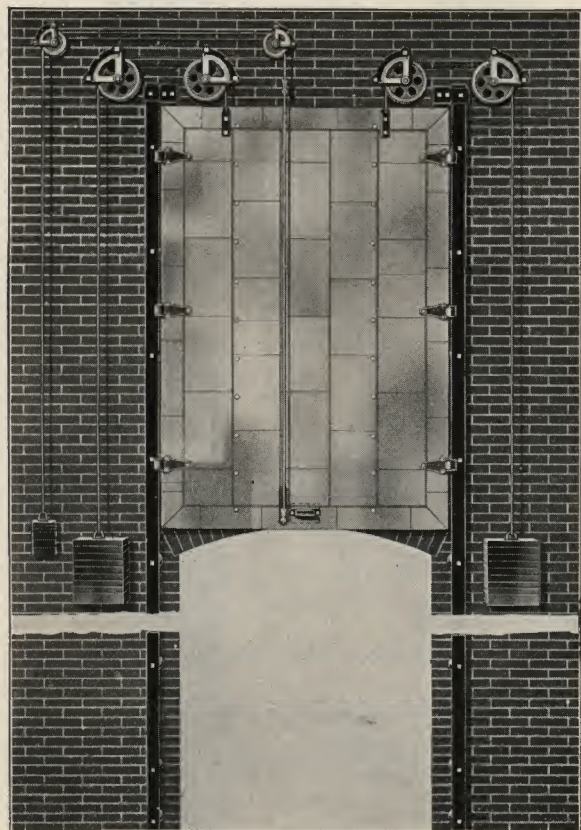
This arrangement approved by Underwriters for openings not exceeding 80 square feet in area with neither width nor height exceeding 10 feet.
